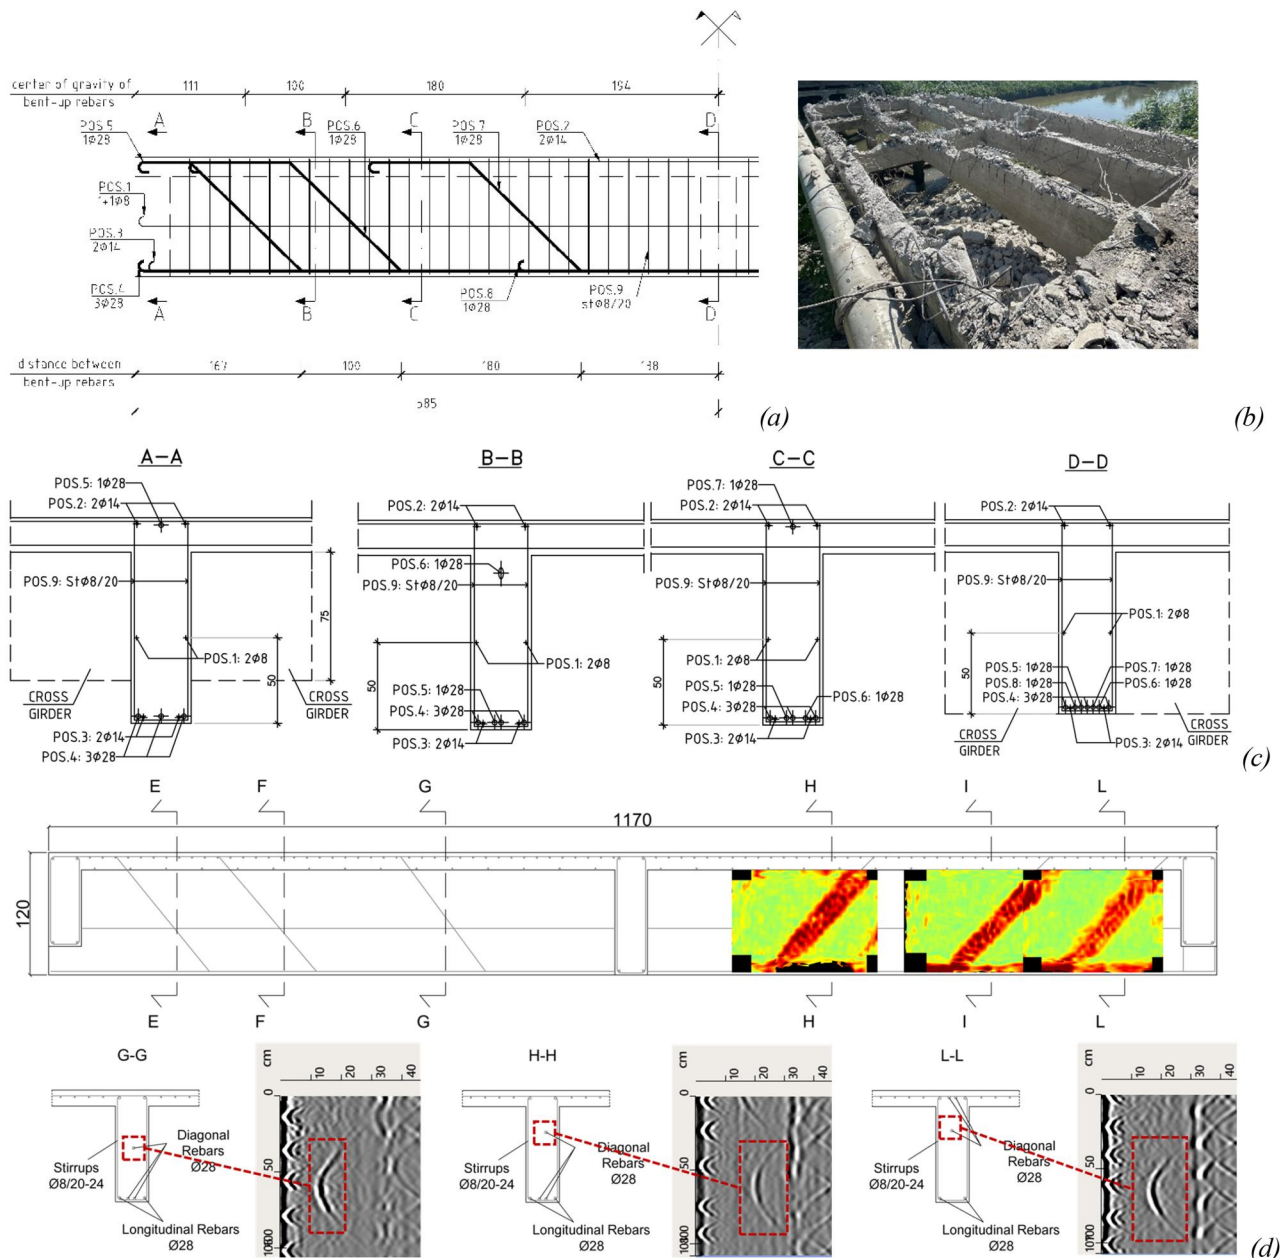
Survey of reinforcement of the lateral bridge beam: a) reinforcement layout; b) photo of reinforcements of the demolished beam; c) cross sections of the beam; d) Ground Penetrating Radar (GPR) results.
